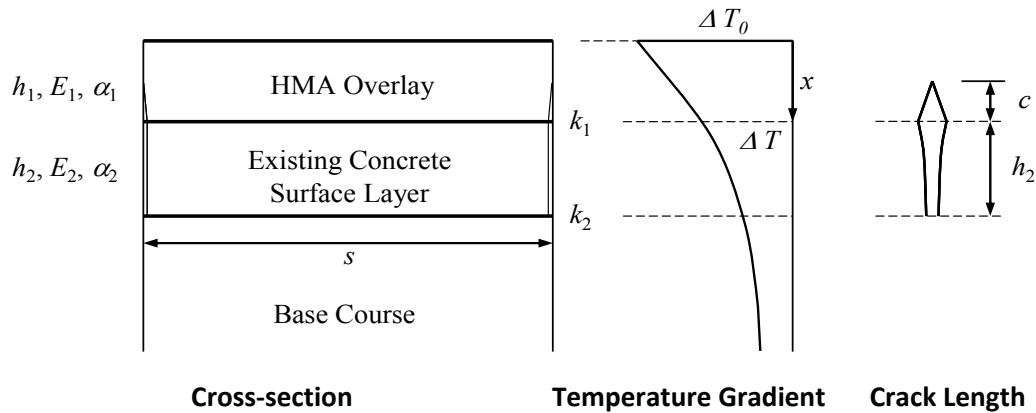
Diagrams of HMA overlay on jointed concrete pavement-thermal.
